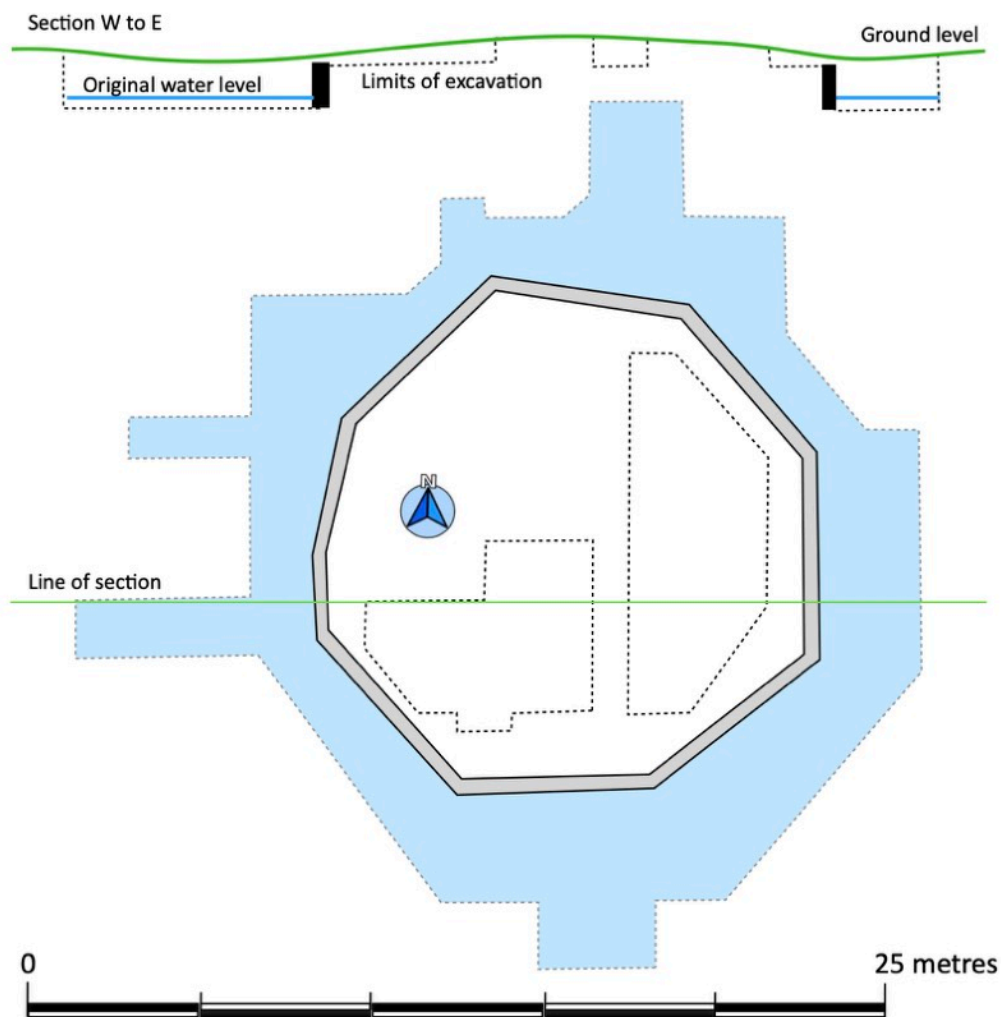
Hanwell, HANK21, plan of the perimeter wall to the central octagon.
